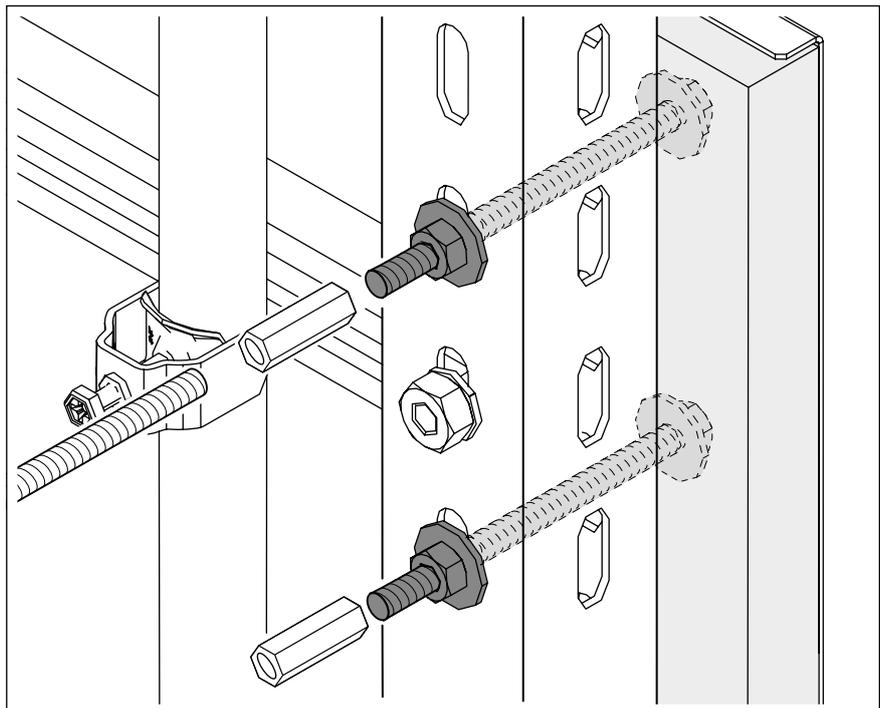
Fastening the back plate to vertical ladder rails with lock plates
